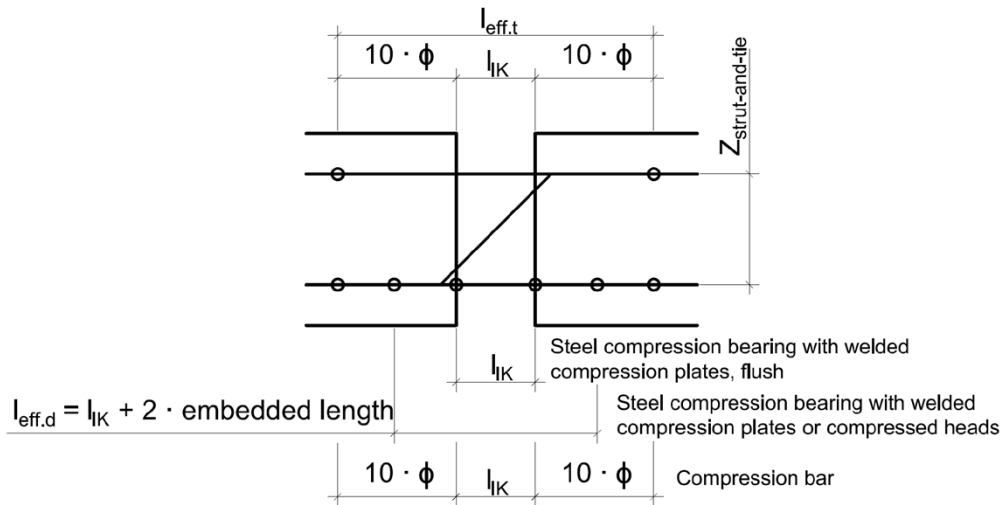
$l_{\text{eff}}$  for tension bars and steel compression elements (SCE) made of stainless reinforcing steel in the joint
